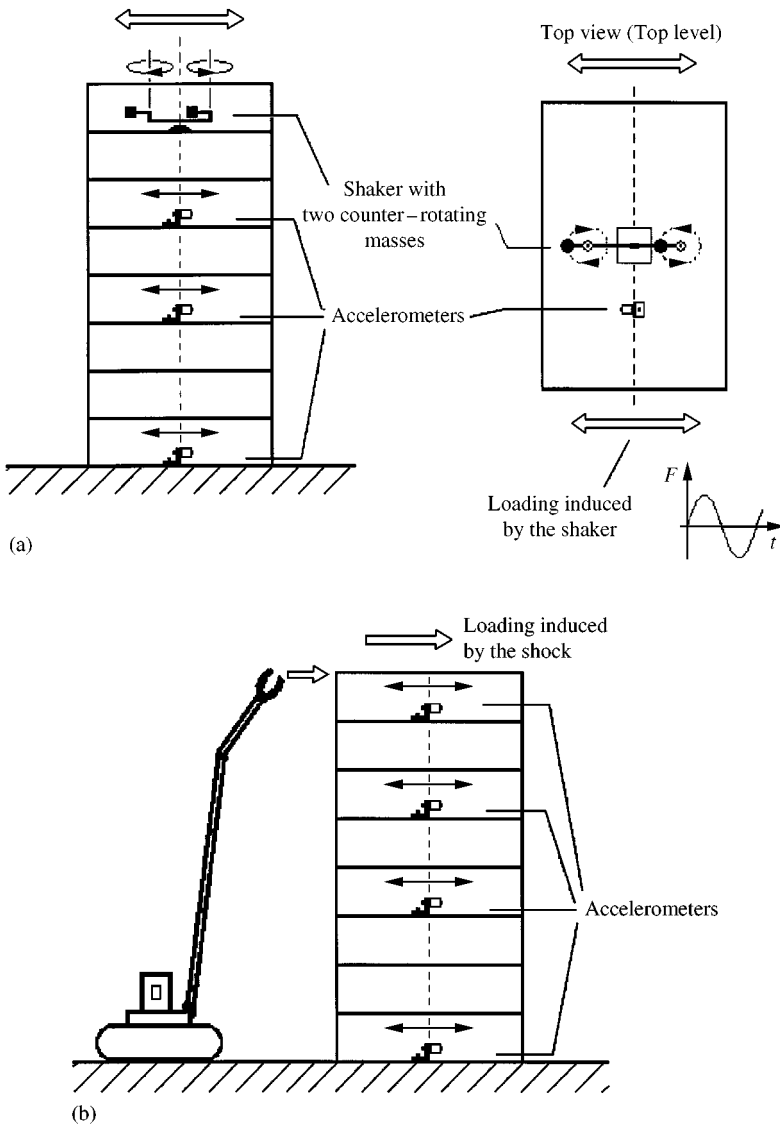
Vertical and horizontal disposal of accelerometers. (a) Harmonic test. (b) Shock test.
